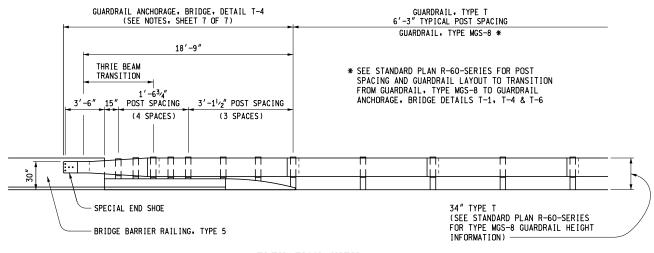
DETAILS FOR CONNECTING GUARDRAIL TO BRIDGE BARRIER RAILINGS, TYPE 4, 2-TUBE, 4-TUBE, AESTHETIC PARAPET TUBE, OR 3 TUBE WITH PICKETS
